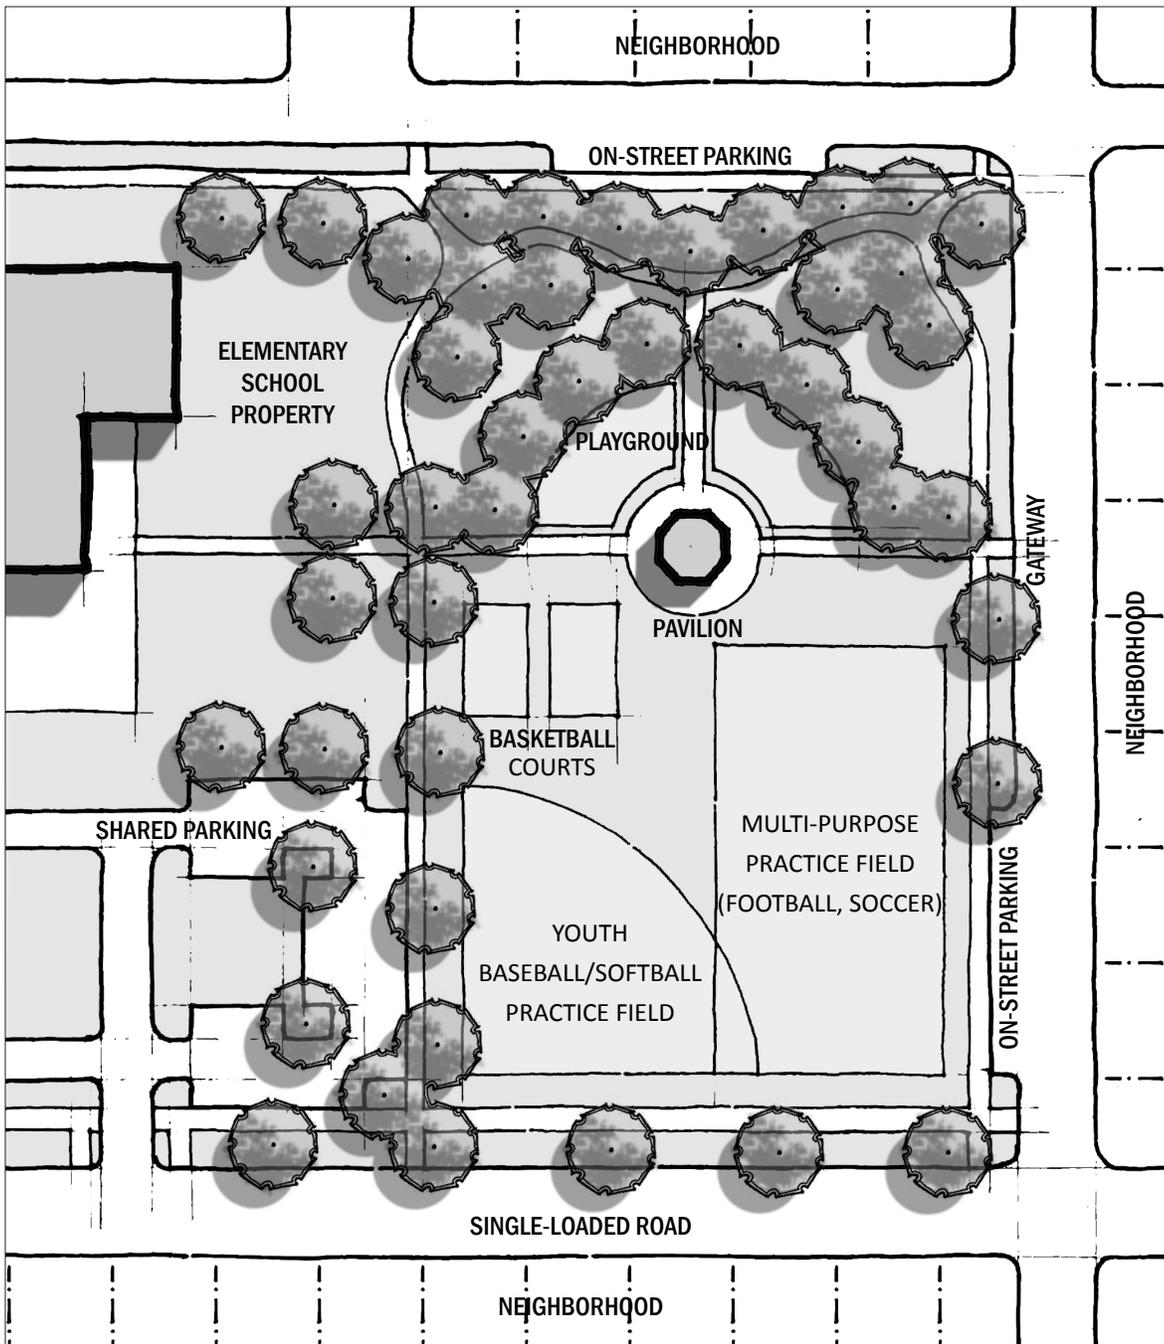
Typical Neighborhood Park Layout (not to a scale)
